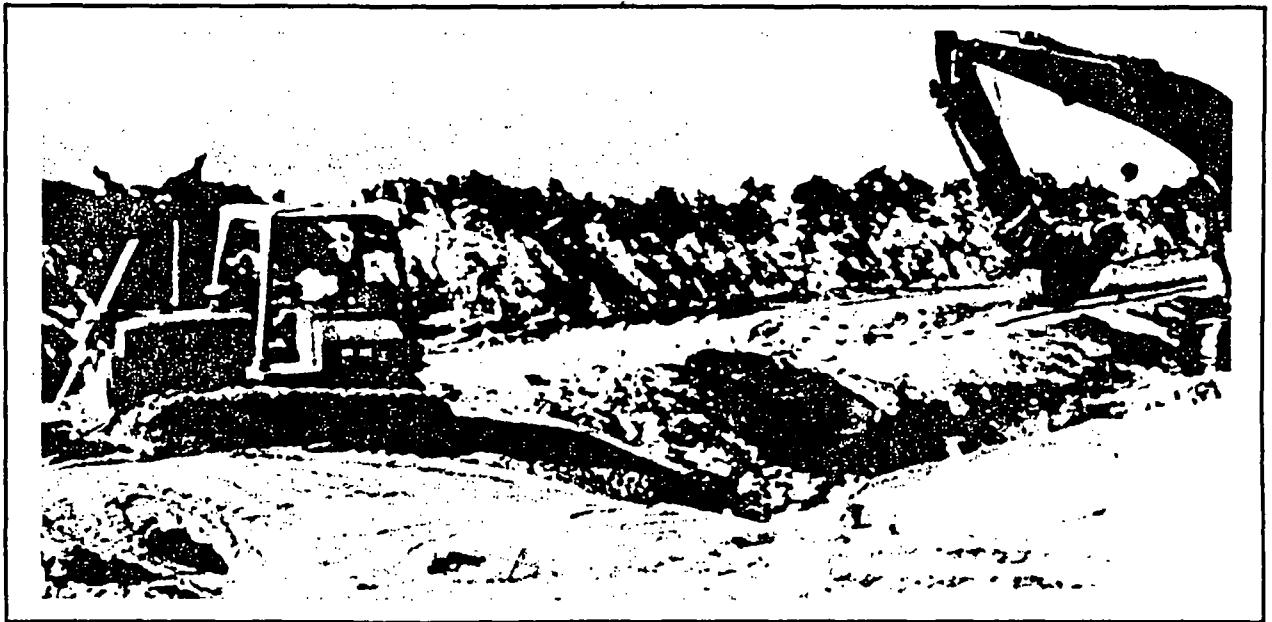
Mixing Backfill with Bentonite Slurry.
